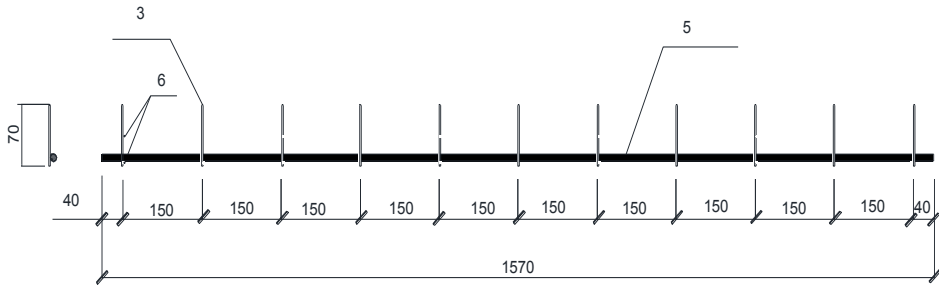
Steel cage frame. Where: 4- steel pins, 5- longitudinal working reinforcing bar, 6- tenon.
